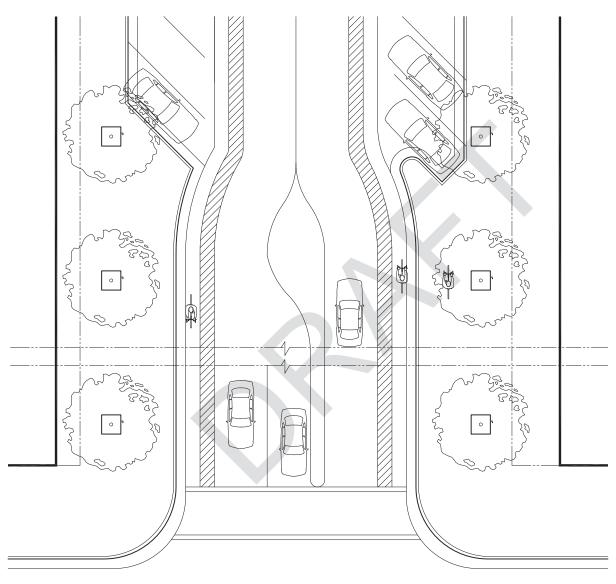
Street Type 1: Typical Intersection (Plan Perspective) [Update pending]
